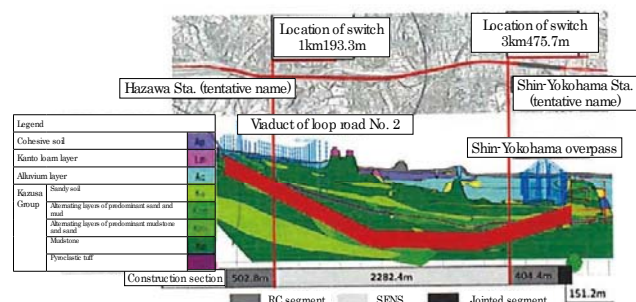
Longitudinal geology profile of Hazawa Tunnel
